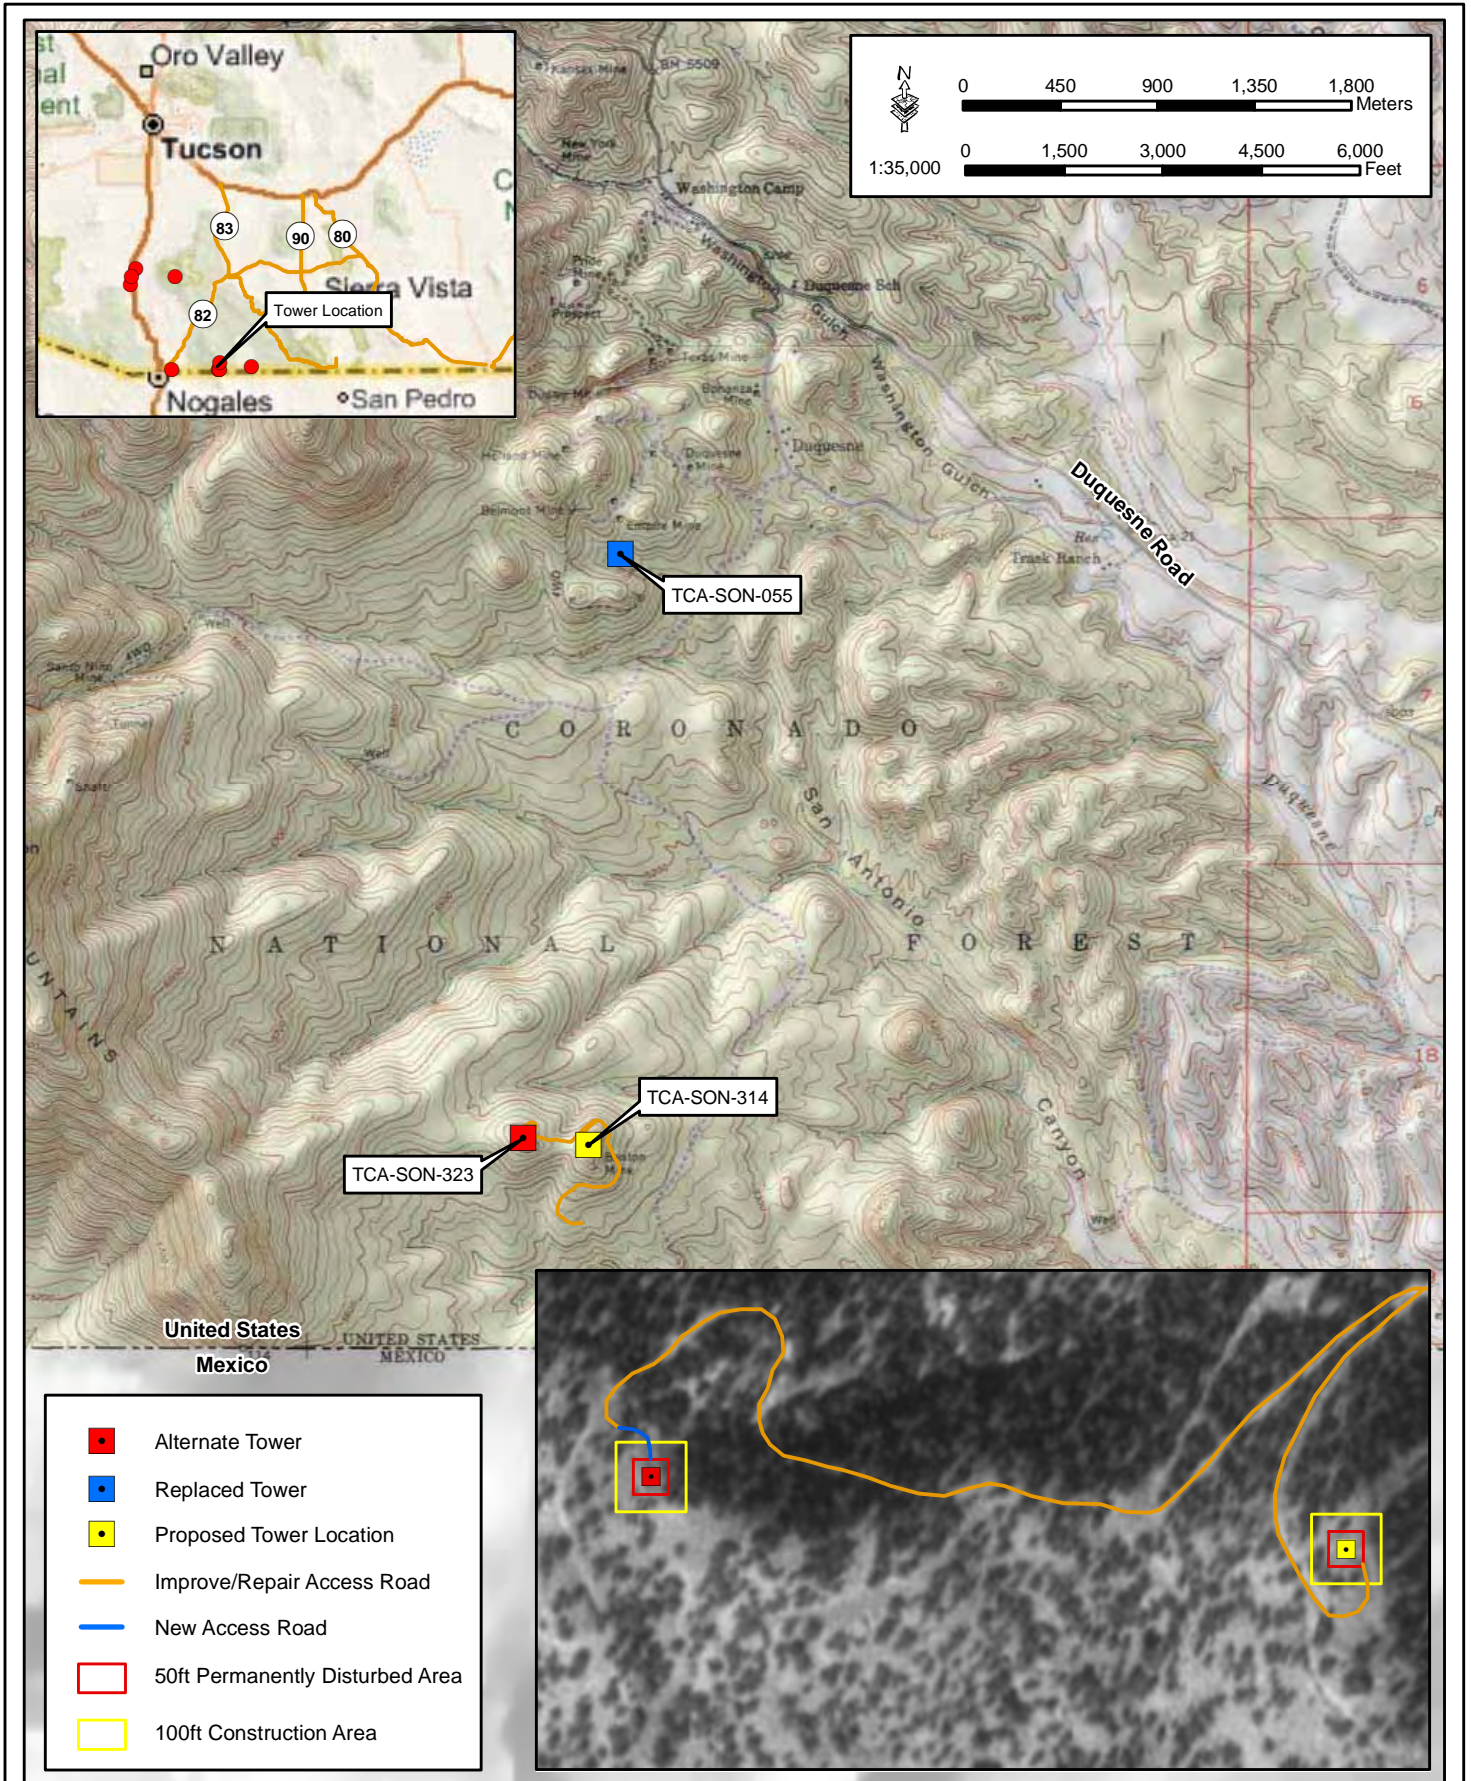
TCA-SON-314 and TCA-SON-323 Towers and Access Roads
